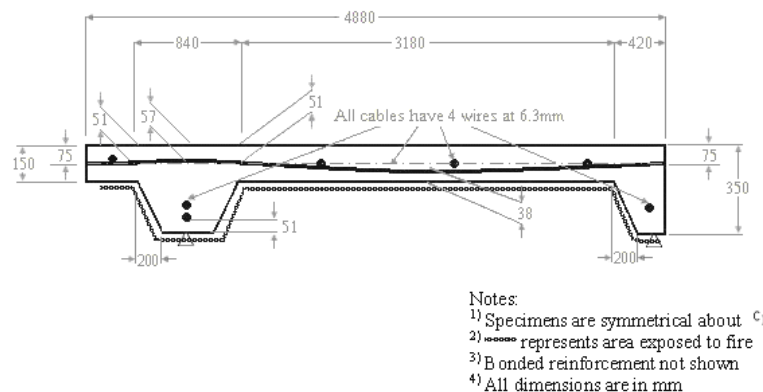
Fire Prevention Research Institute slab and beam test (after Troxell, 1959a).
